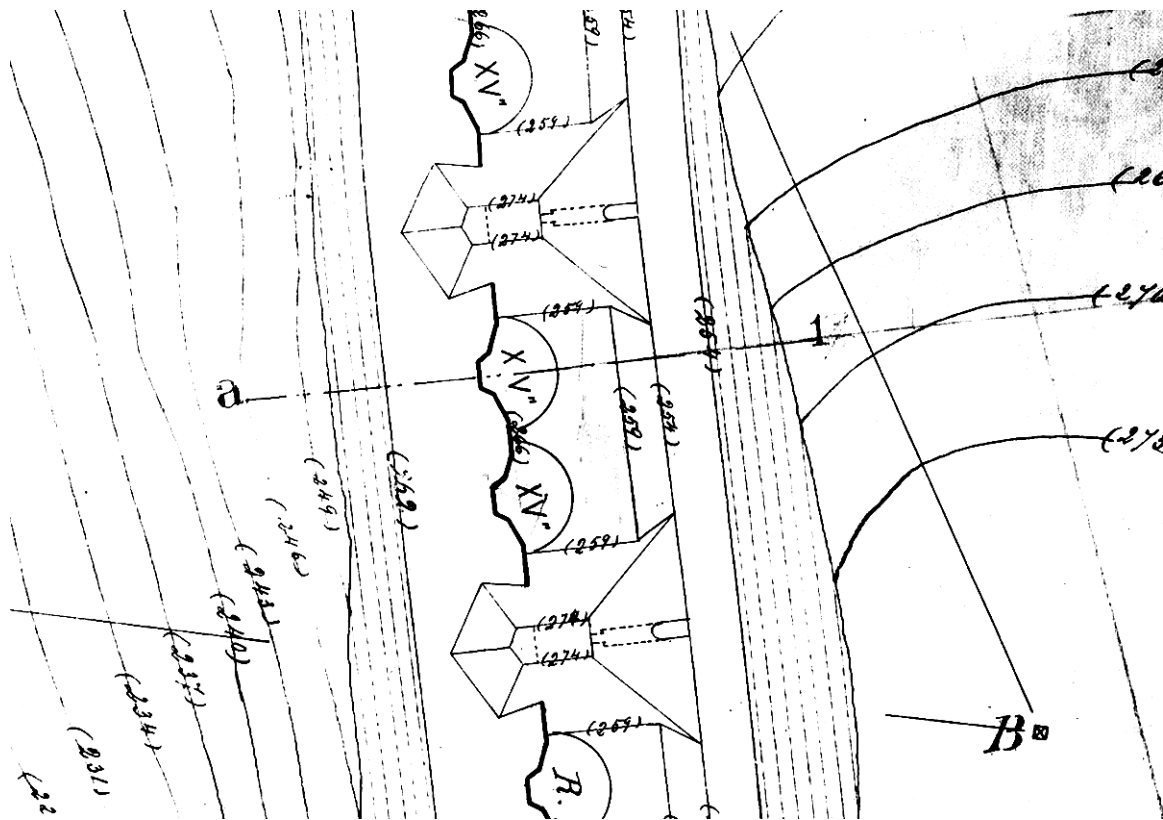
Plan of original 1870 engineer plan showing Traverses 27 (top) and 28 (bottom), and Rodman Positions 59 and 60. Section "a - 1" is the site of the present overlook access road. NARA, RG 77, Dr. 94, Sht. 102.
